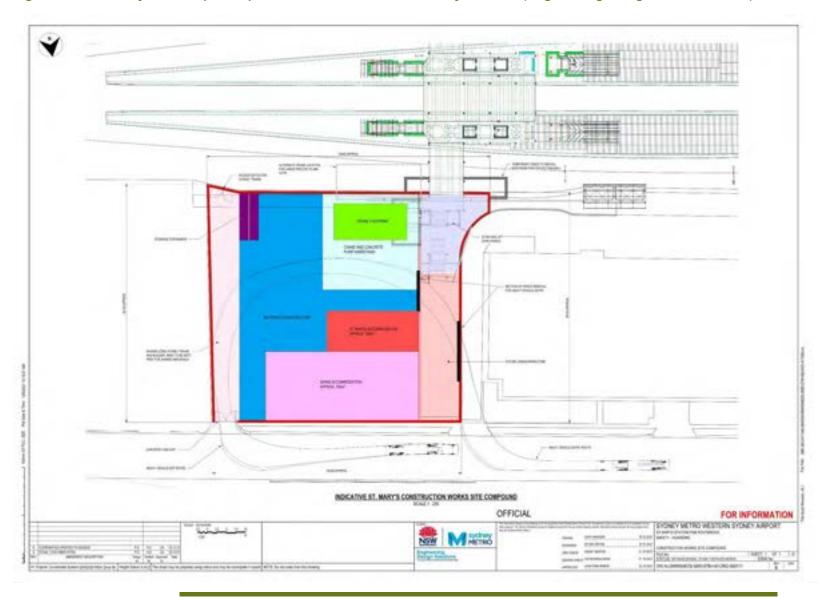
Preliminary site compound plan for the FSM works at St Marys Station (Engineering Design Solutions 2022)
